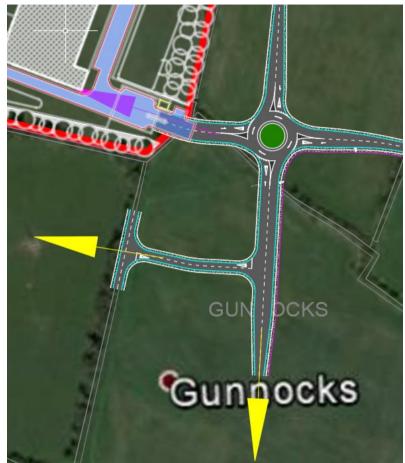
Proposed Permanent Site Access via Roundabout onto future Distributor Road
